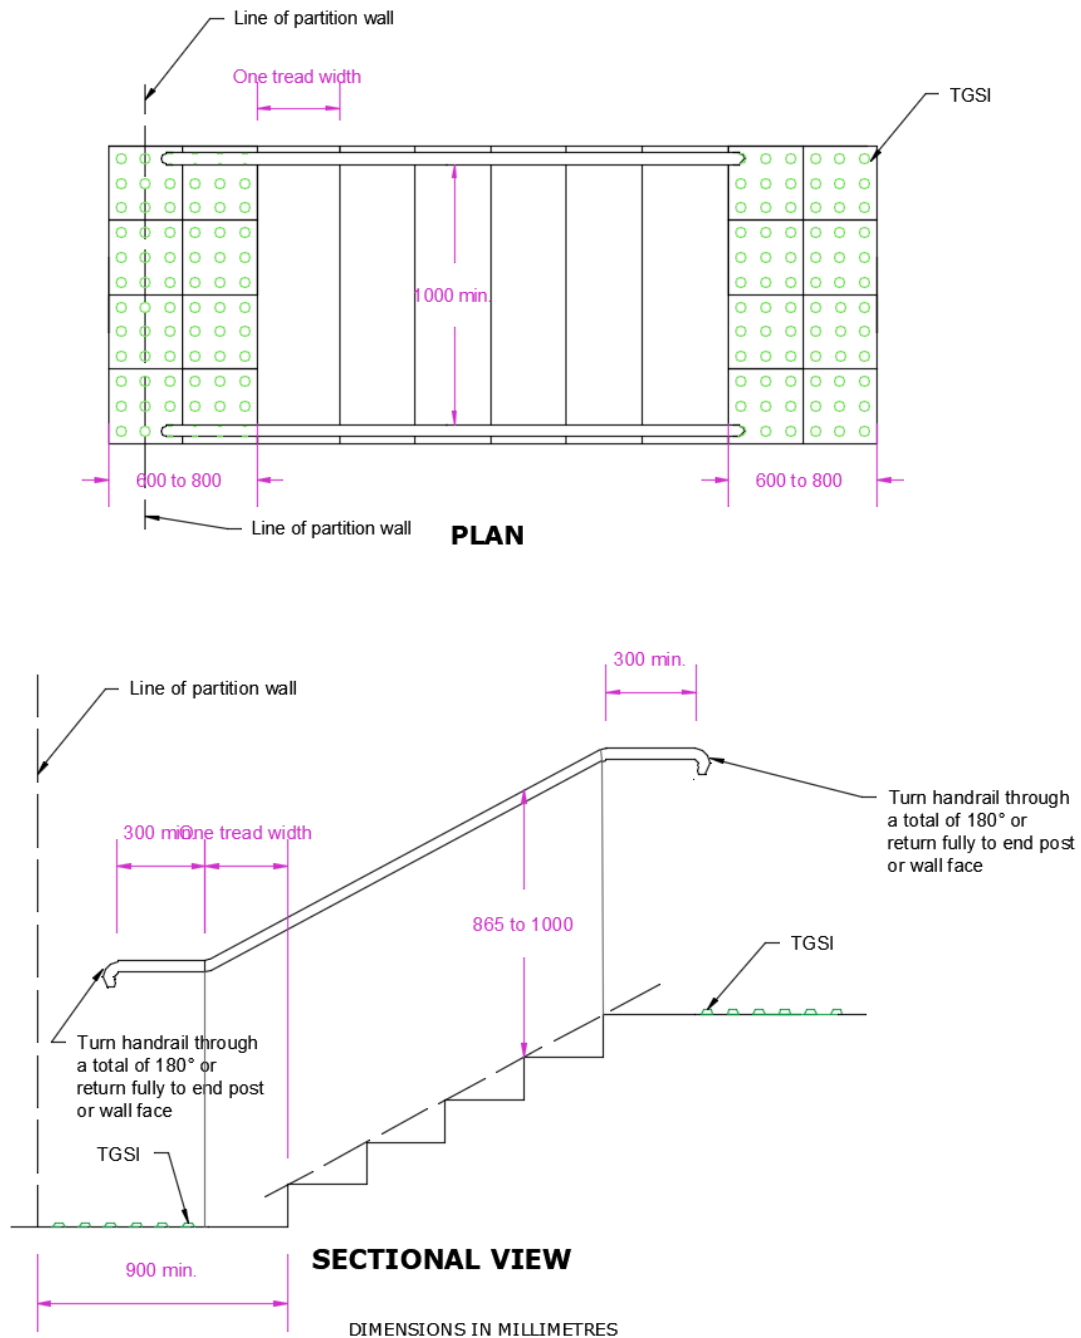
Stairway location and handrail extensions at end of stairway other than at line of boundary
